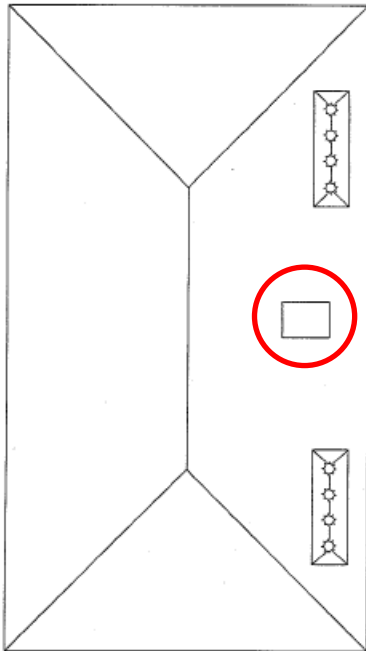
Drawing Upper Floors (30 June 2008) showing rectangular roof and skylight.
